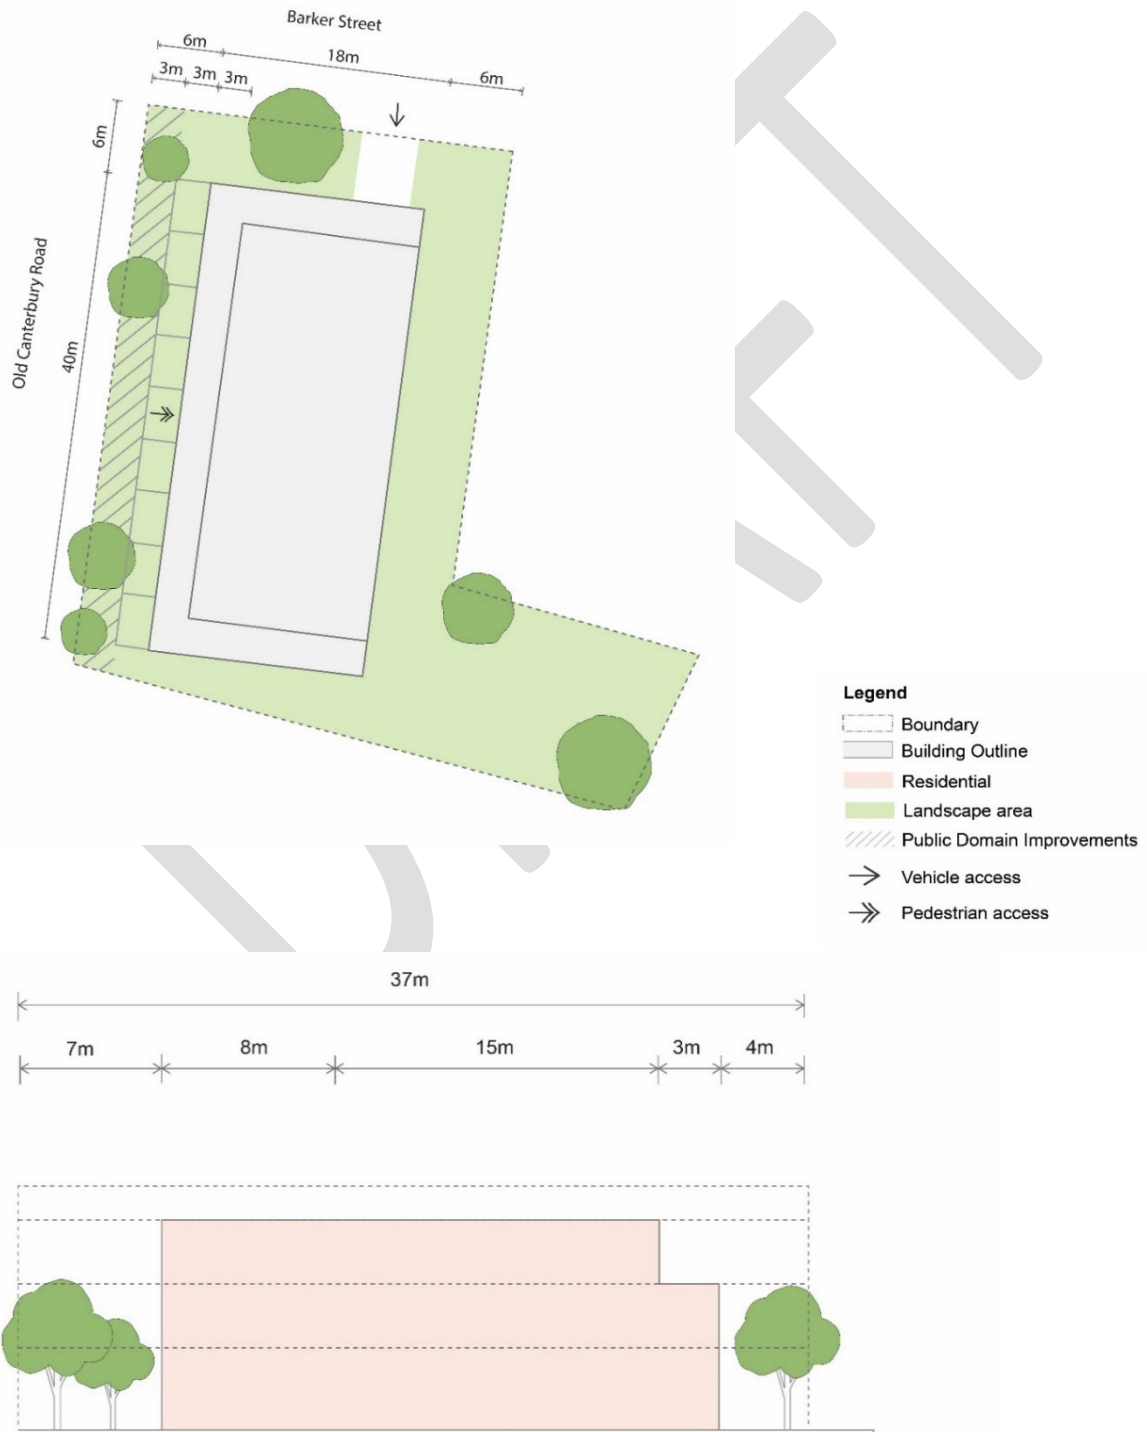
Canterbury Road East, southern site indicative solution that achieves storeys, building envelope, scale and site layout – plan and section
